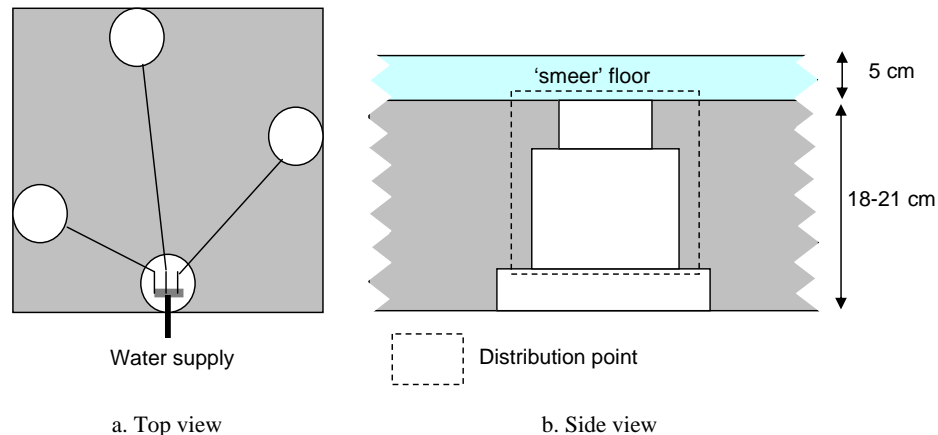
Top and side view of the concrete floor with pipe distribution points.
